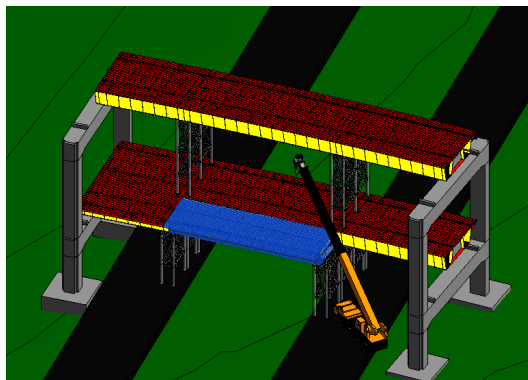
BIM model for hoisting of section III in lower left steel box girder
